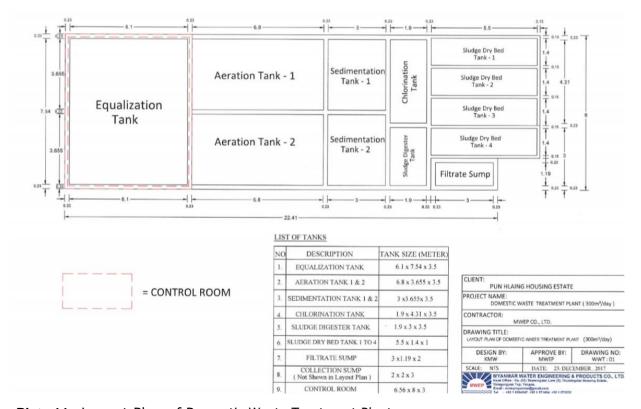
Layout Plan of Domestic Waste Treatment Plant
